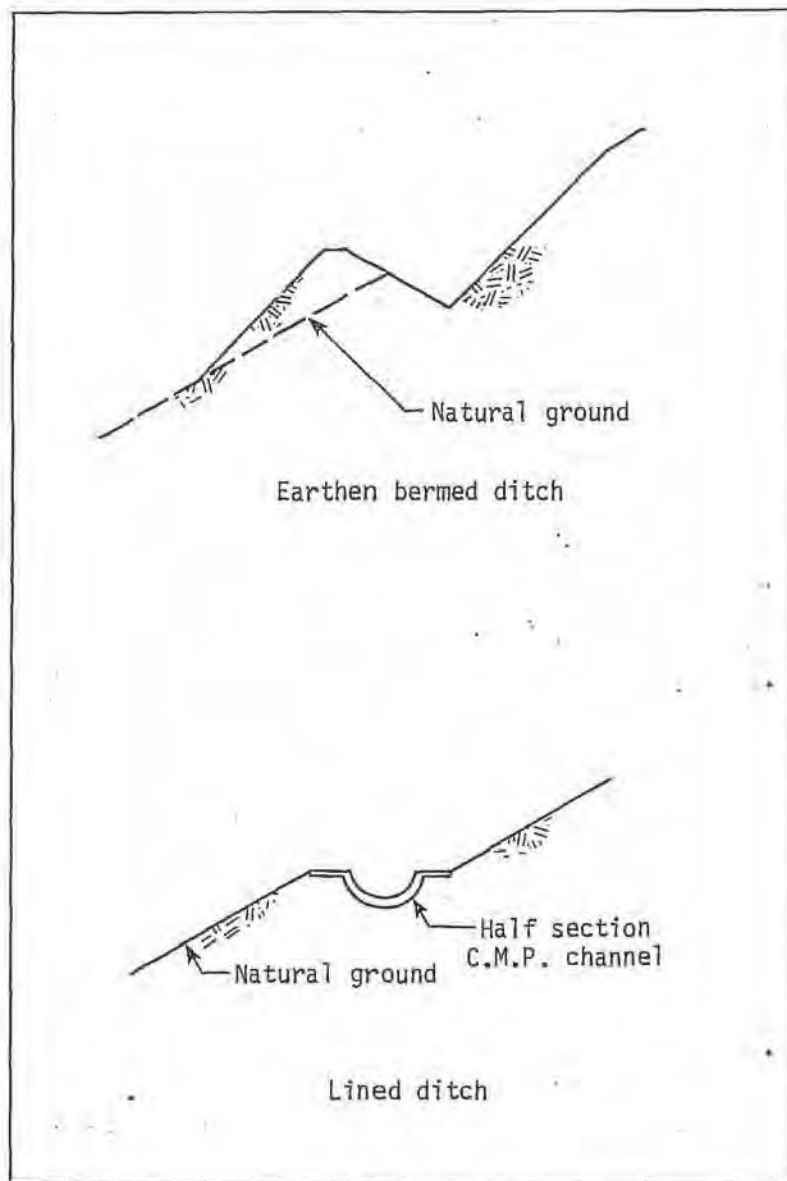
Typical ditches and berms (dimensions are site-specific).
